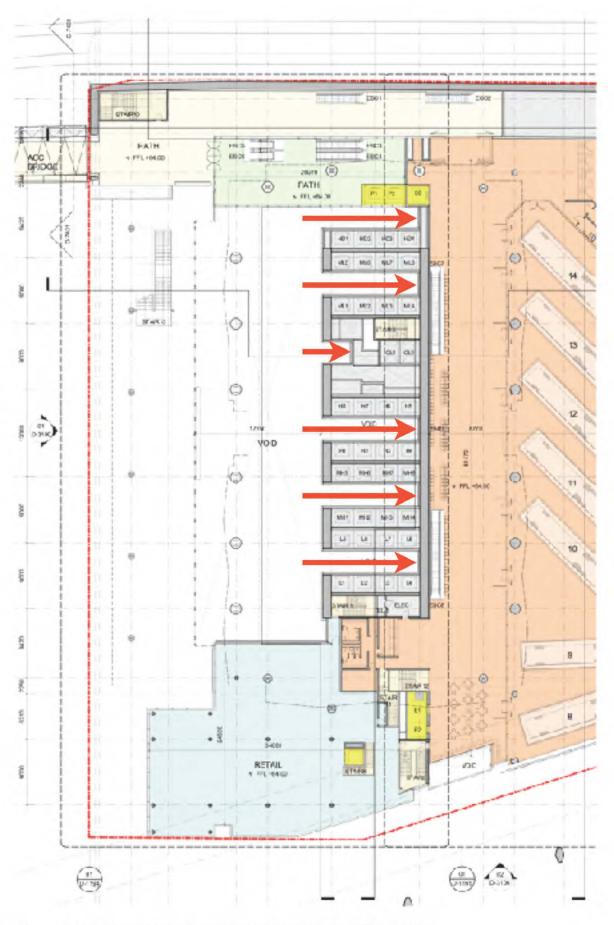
PLAN SHOWING ELEVATOR NICHES ART SITES
